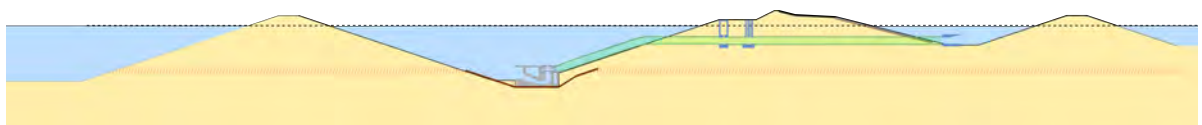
Extrusion of sheet piles and flooding of construction pit
